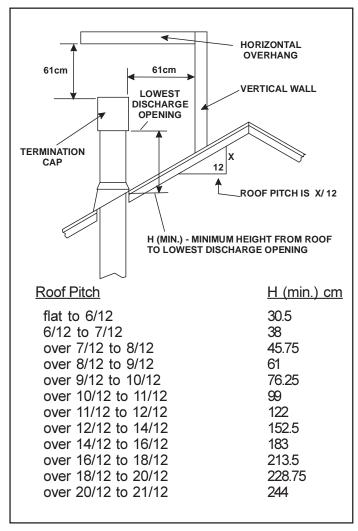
Minimum Height from Roof to Lowest Discharge Opening
